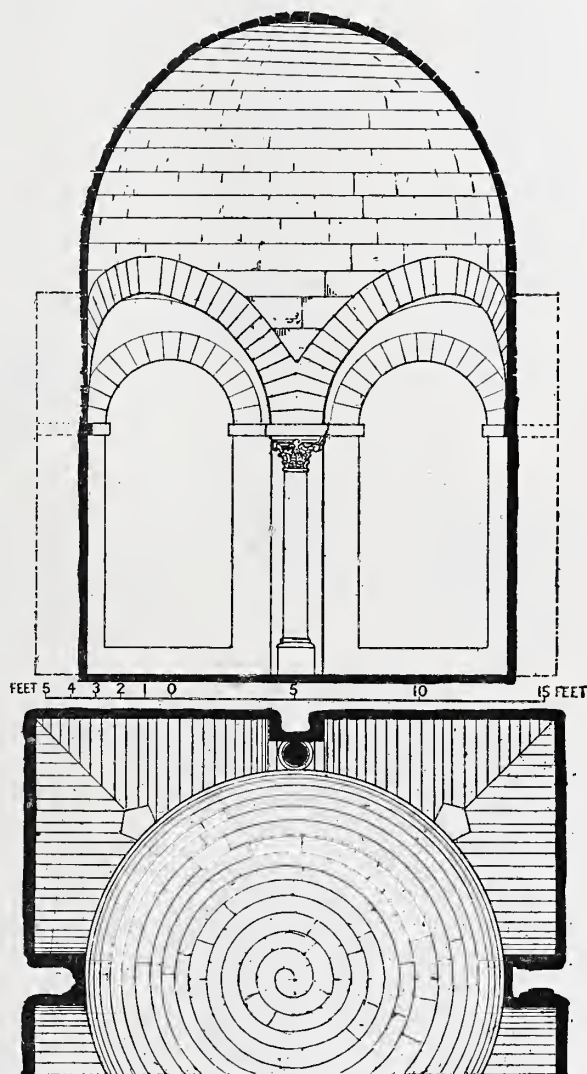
PLAN AND SECTION OF CHAMBER IN TOWER, BRANTÔME.
